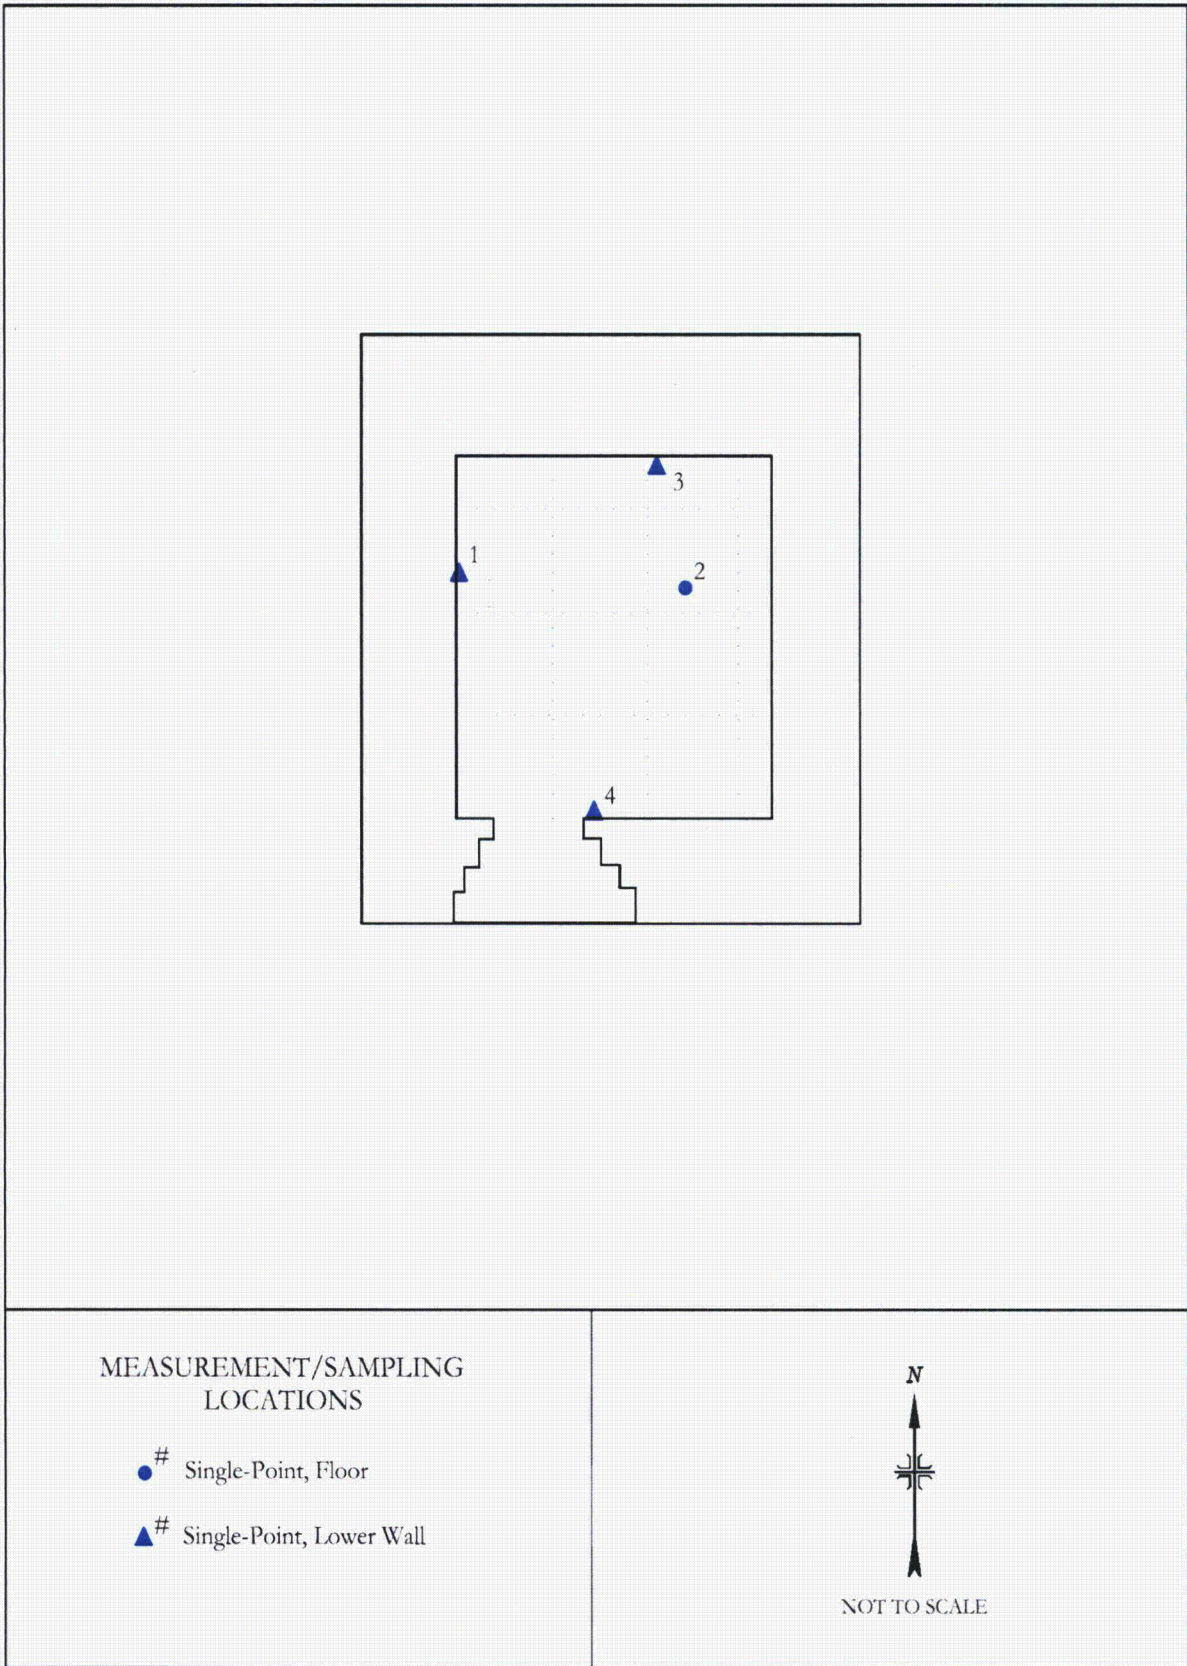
Auxiliary Building, Room 47 - Direct Measurement Locations
